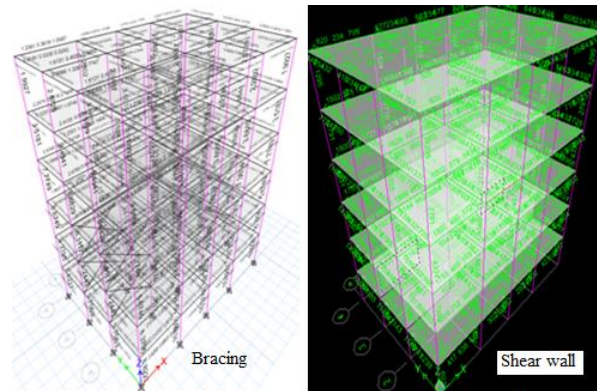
Retrofitted Structures with Bracing and Shear Wall
